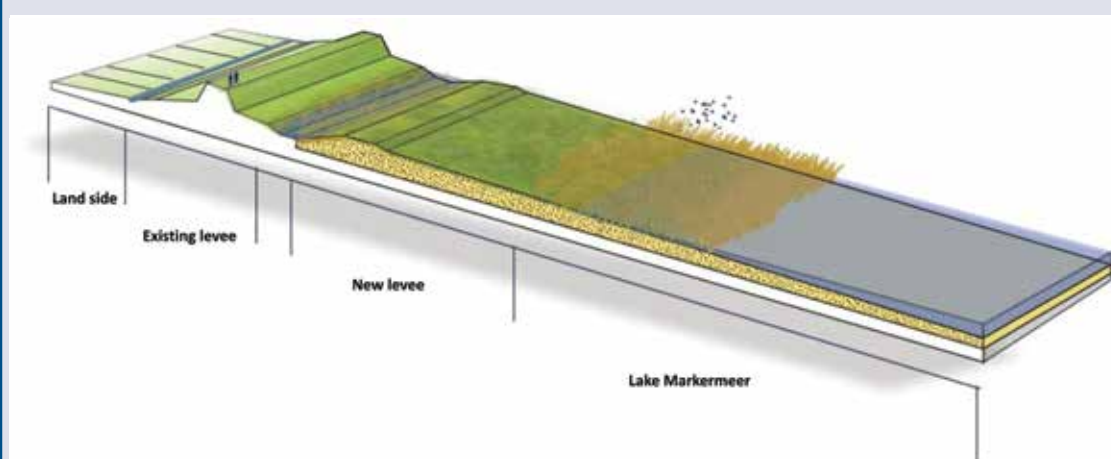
Cross-sectional profile of old and new levees (courtesy T GA Cents, ARCADIS and Hoogheemraadschap Hollands Noorderkwartier Vliet)
